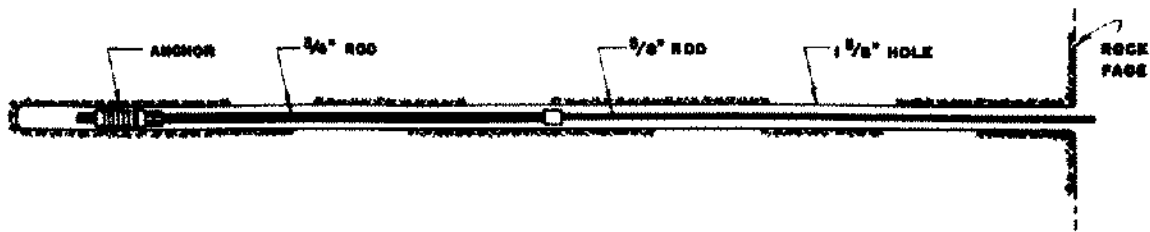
A. Inserted Anchor Bolt -- Elevation.
